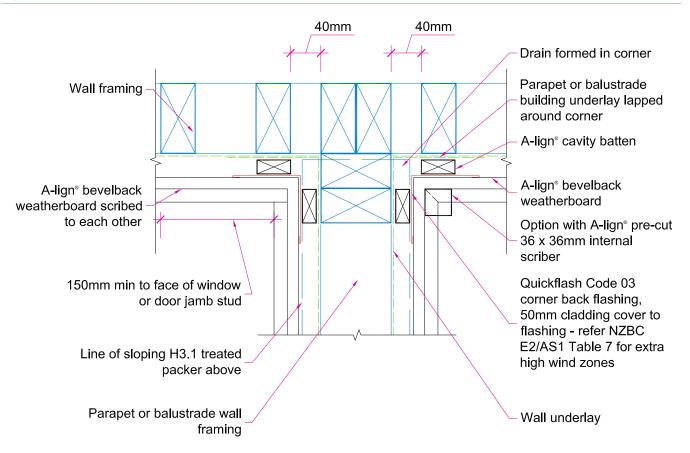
Cavity fixed – parapet – balustrade – wall junction
